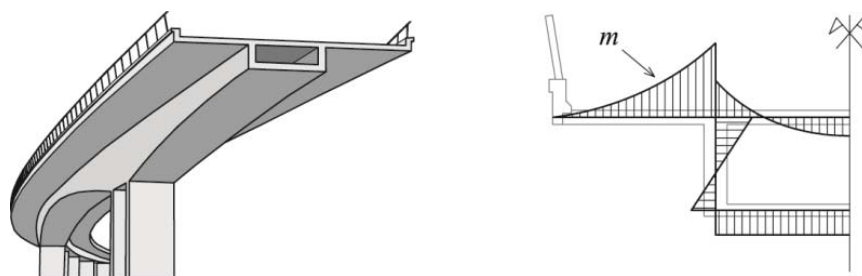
Left: Box-girder bridge. Right: transverse bending moment diagram for uniform load
